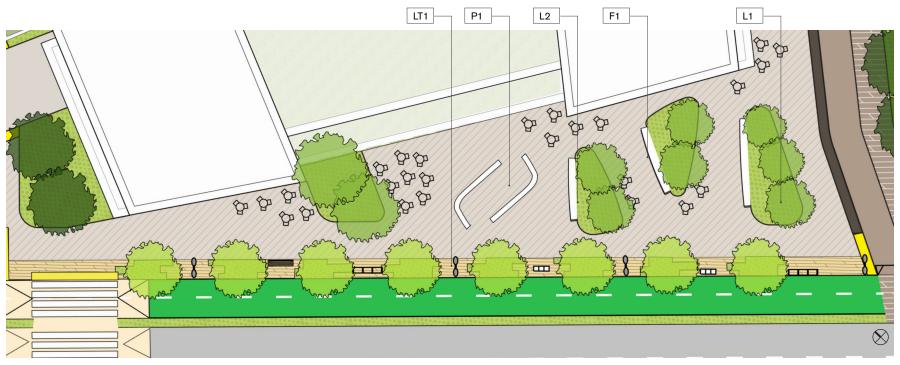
TOWN TRIANGLE ENLARGEMENT PLAN
